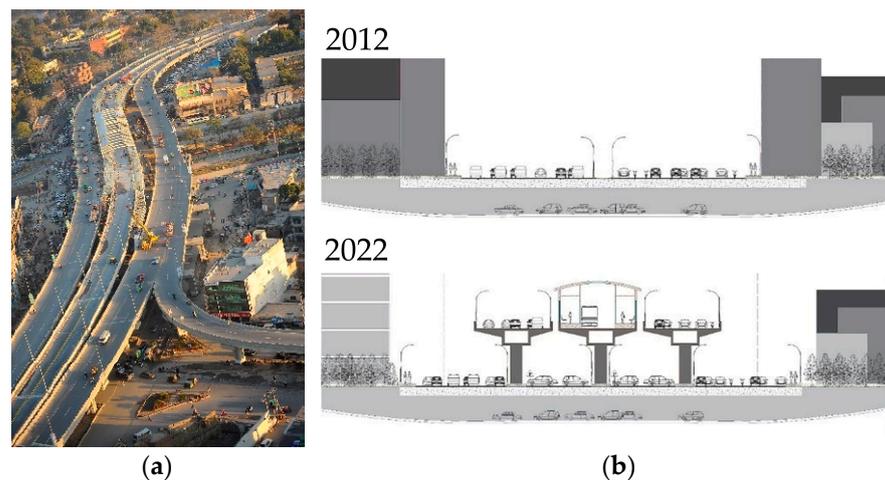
(a) The flyover and elevated station dominating the area. (b) Transformation of a road section at Canal Station (adapted from [52]).
